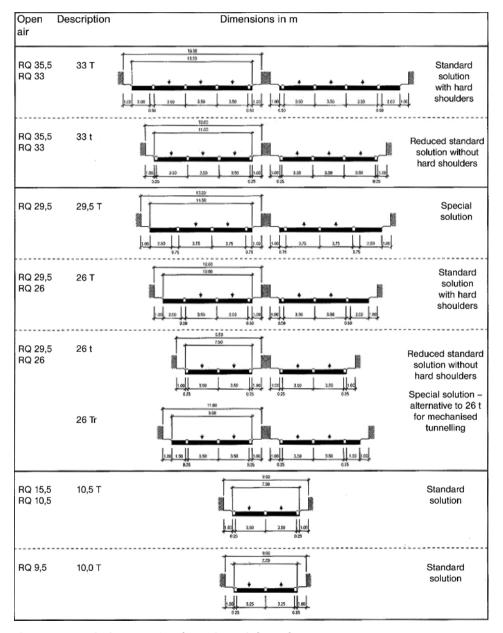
Standard cross-sections for road tunnels [33, 77].
